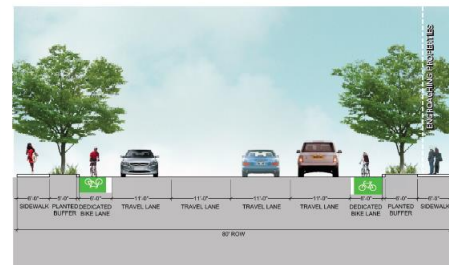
Dixie Drive from Mykawa Road to Telephone Road - Alternate B
